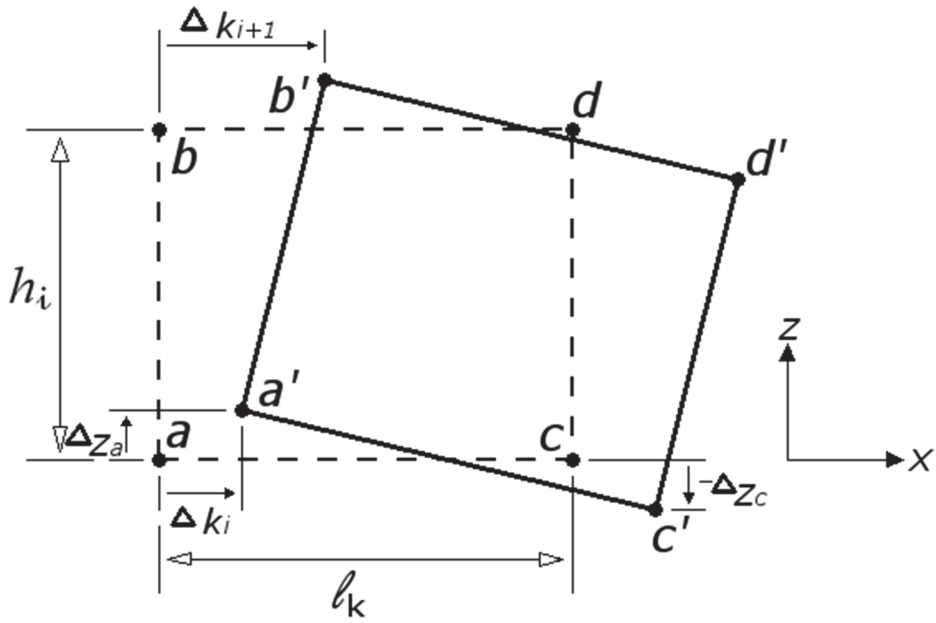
Schematic elevation view of building story panel for calculation of story drift ratio (SDR) and racking ratio (RR).
